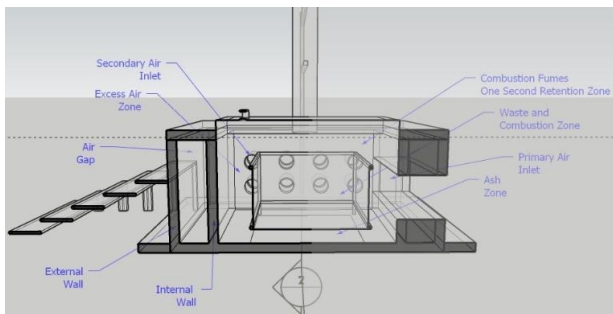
3-D, X-Ray, section drawing of the incinerator showing the combustion zone.
